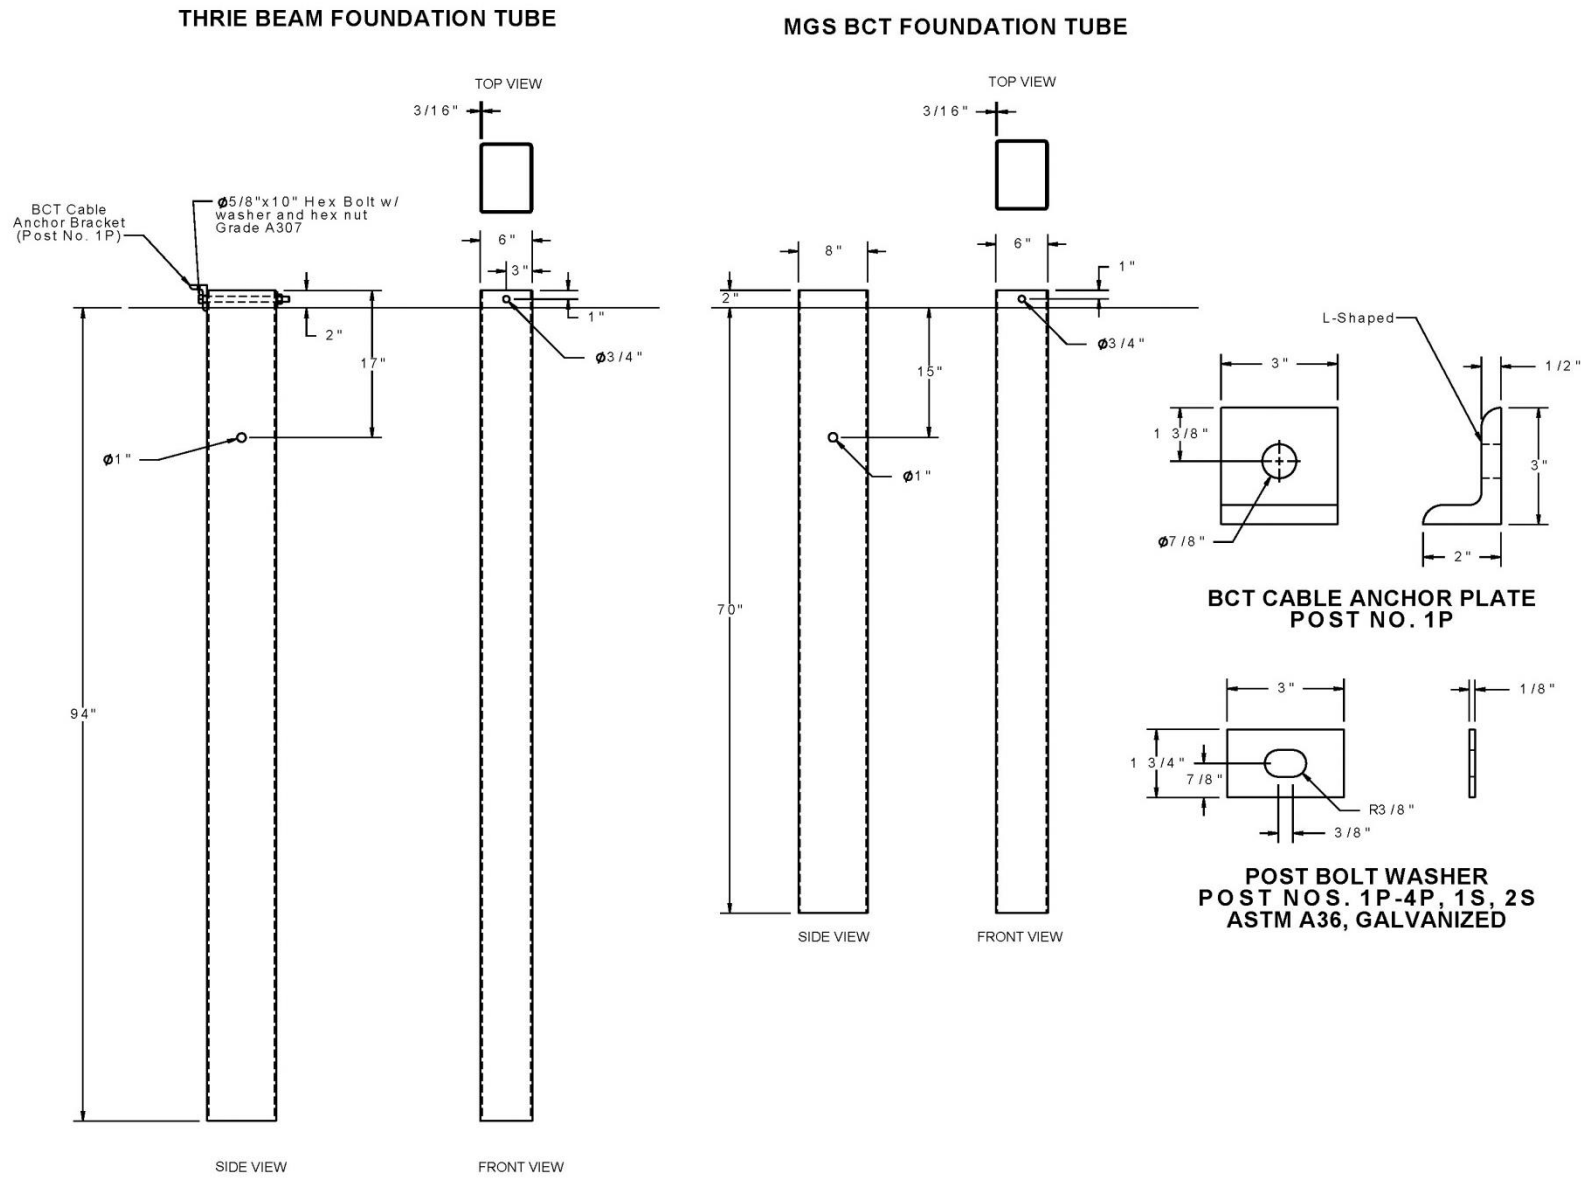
Foundation Tube Details, MwRSF Short Radius Design [14]
